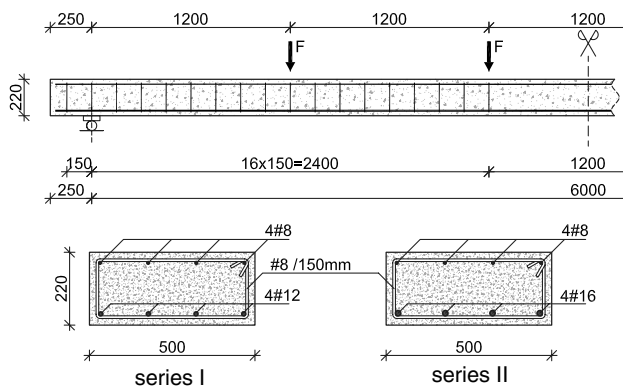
Test specimen geometry, details, and loading arrangement (dimensions in mm)
